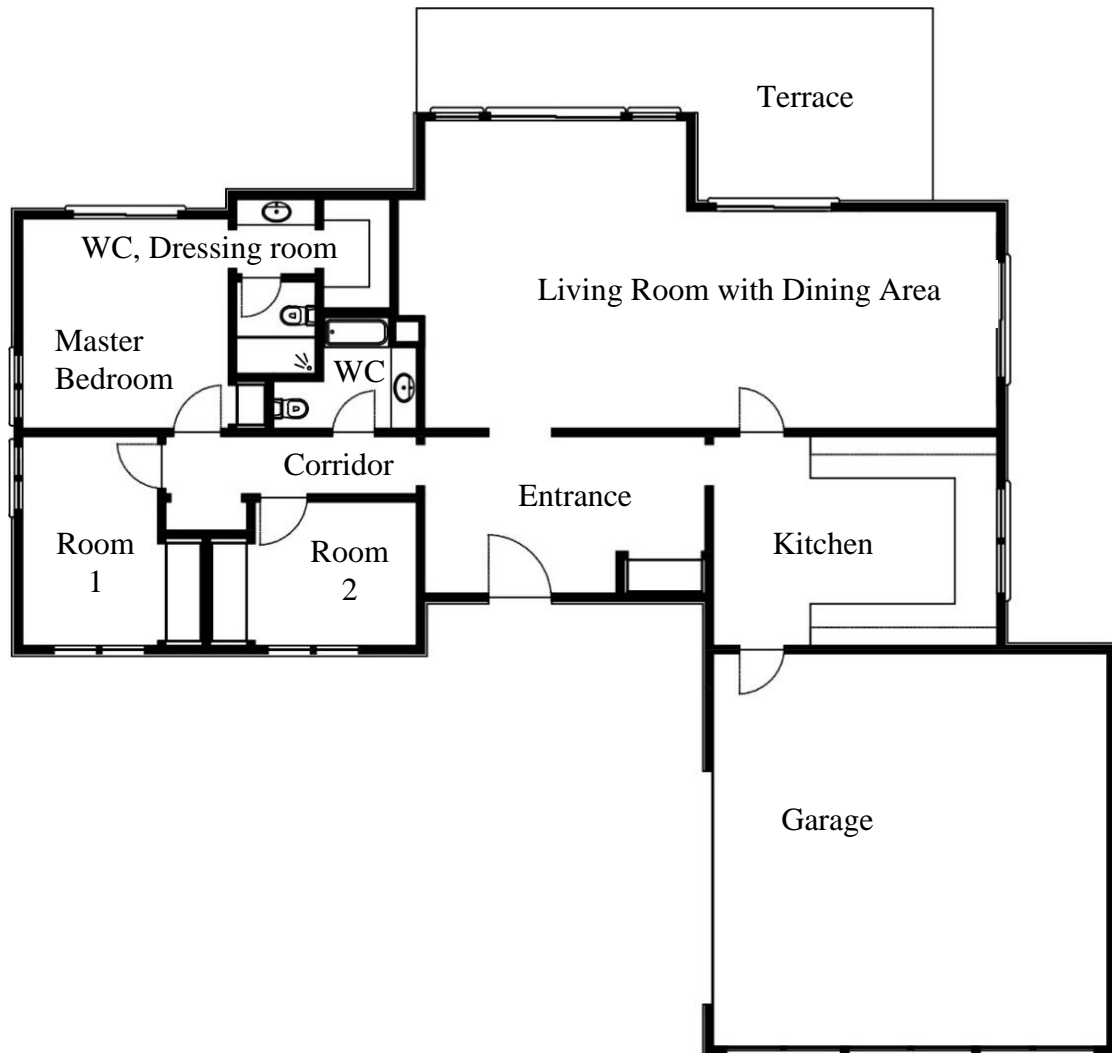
One single story residential plan (Adapted from Kicklighter et al., 1990, p.35).
